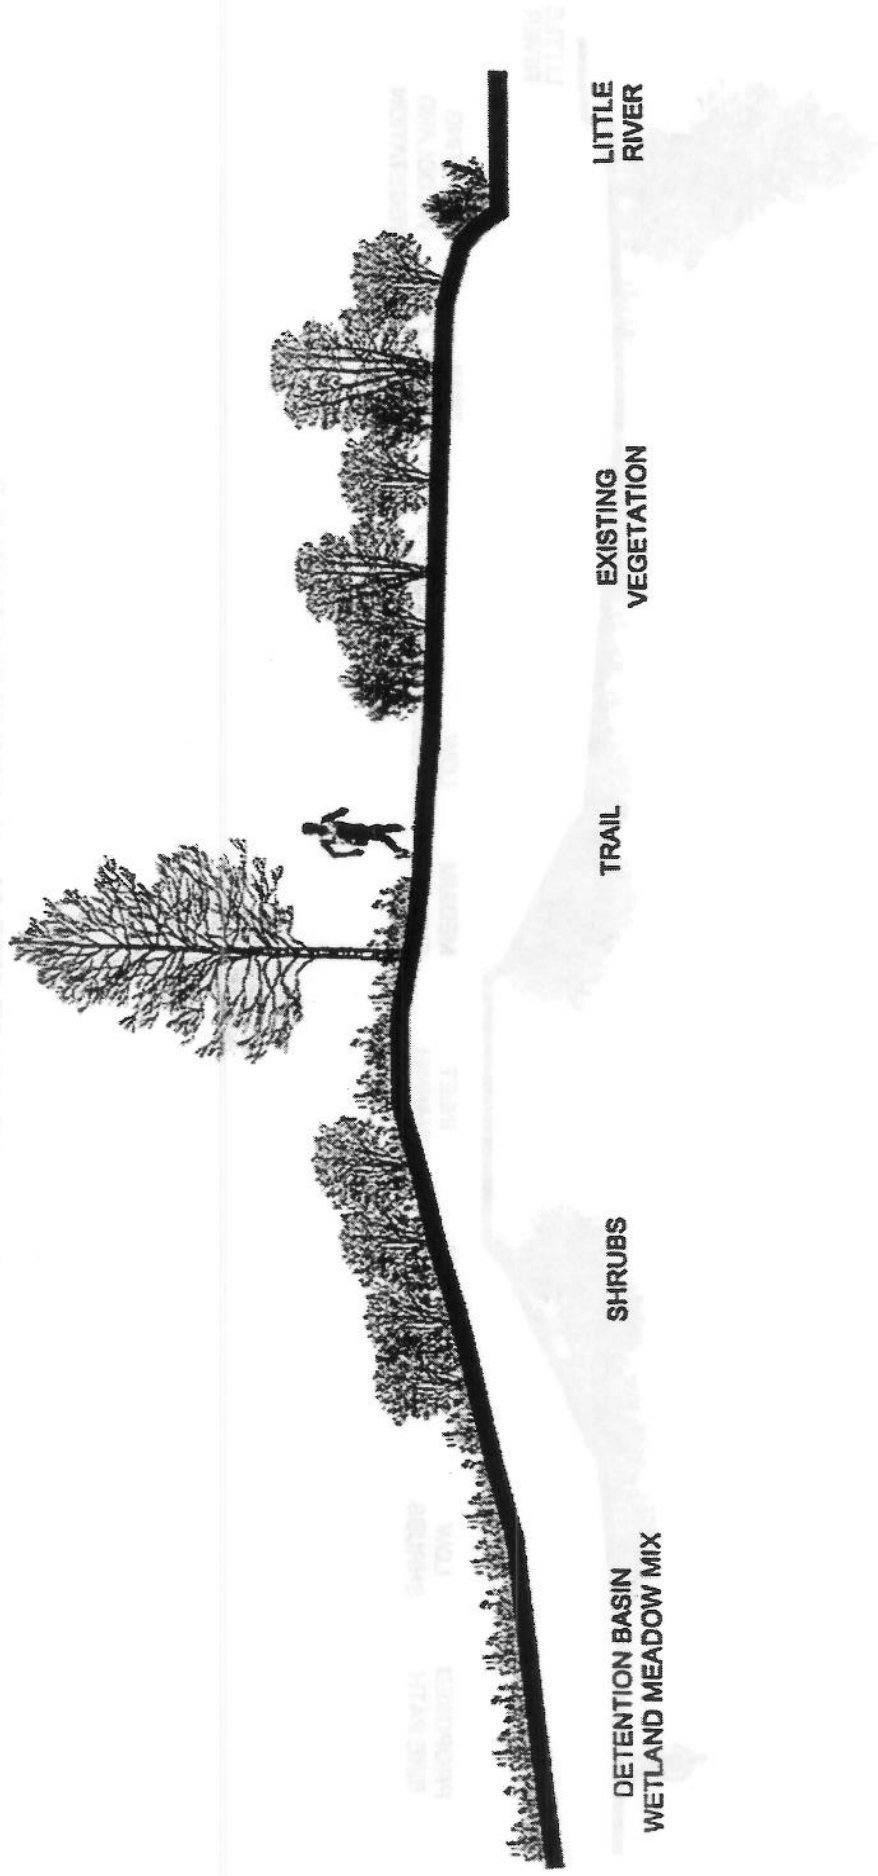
LANDSCAPE SITE PLAN; CROSS SECTION A-A
